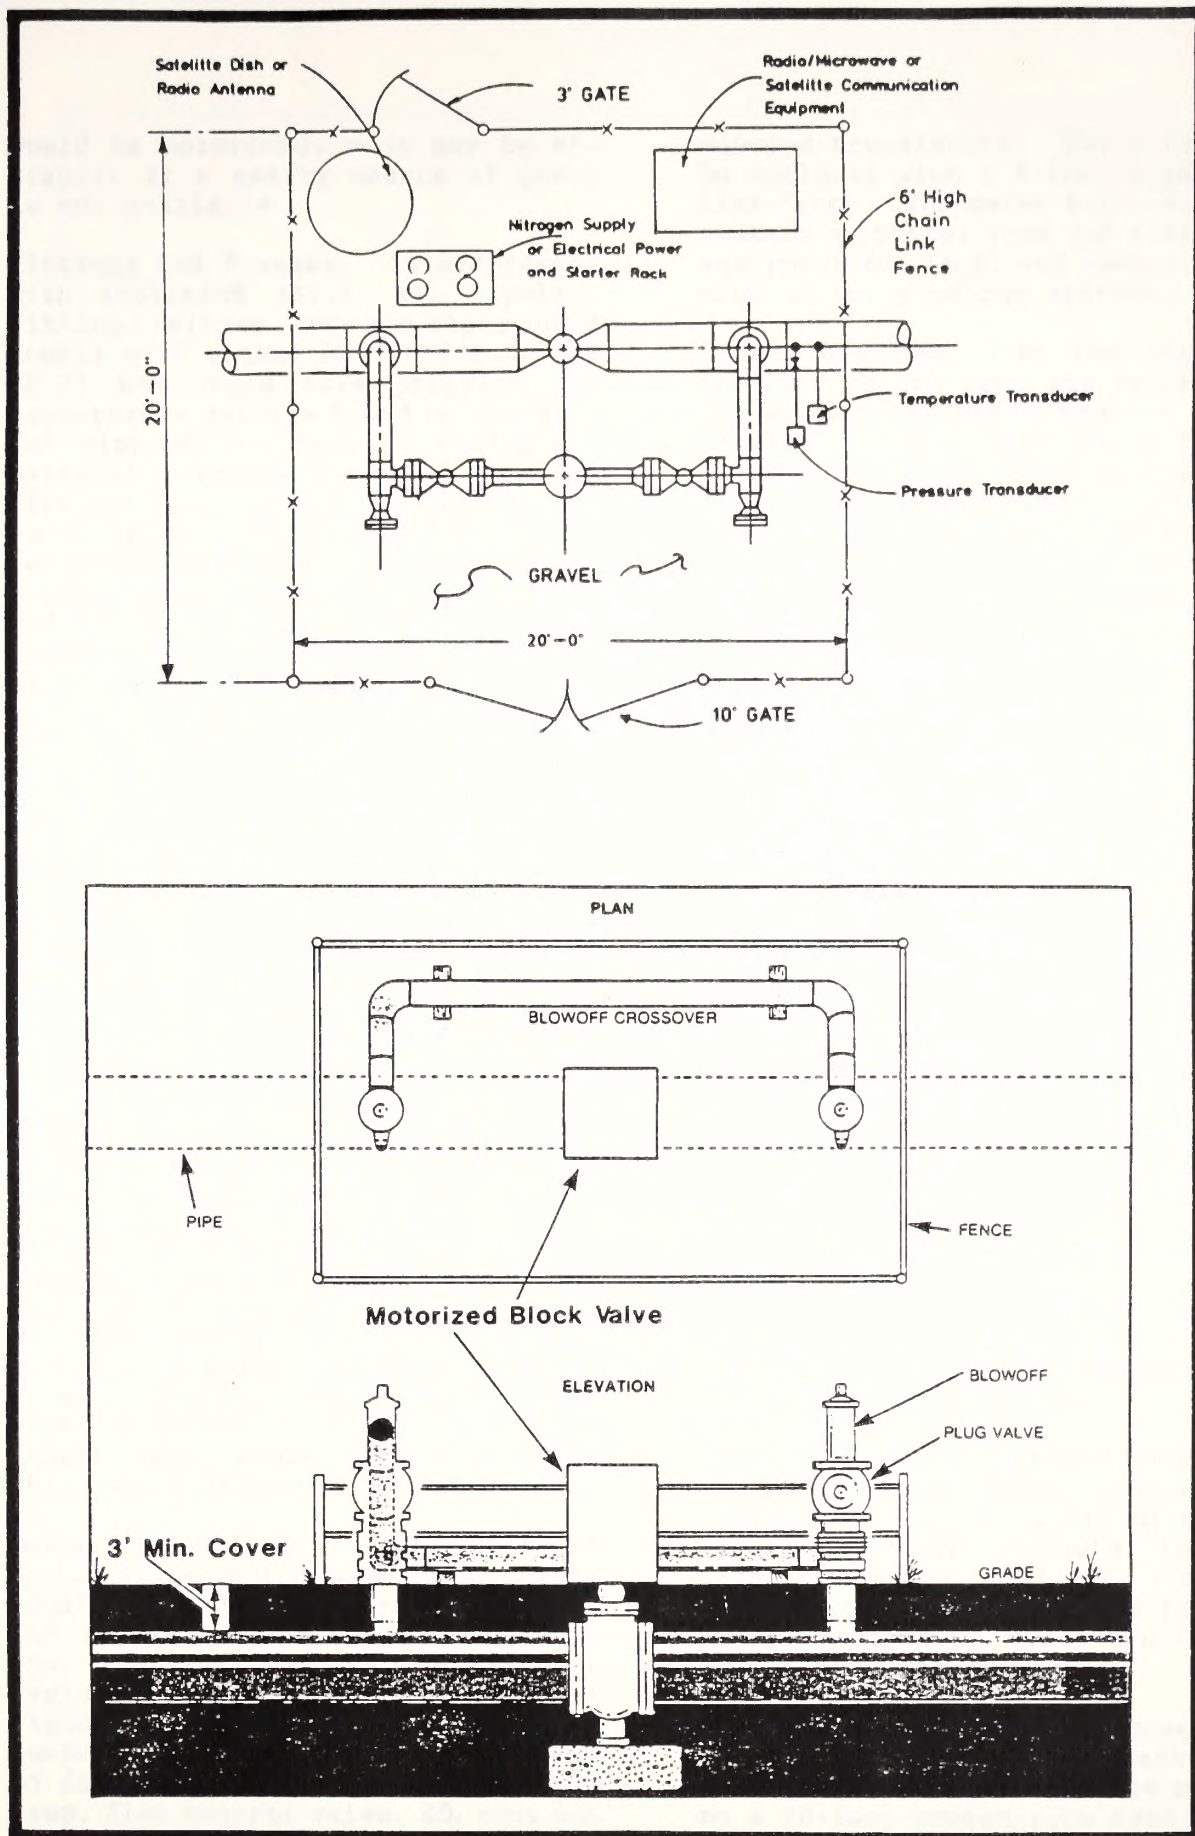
Plot Plan and Profile of Typical Block Valve Assembly.
